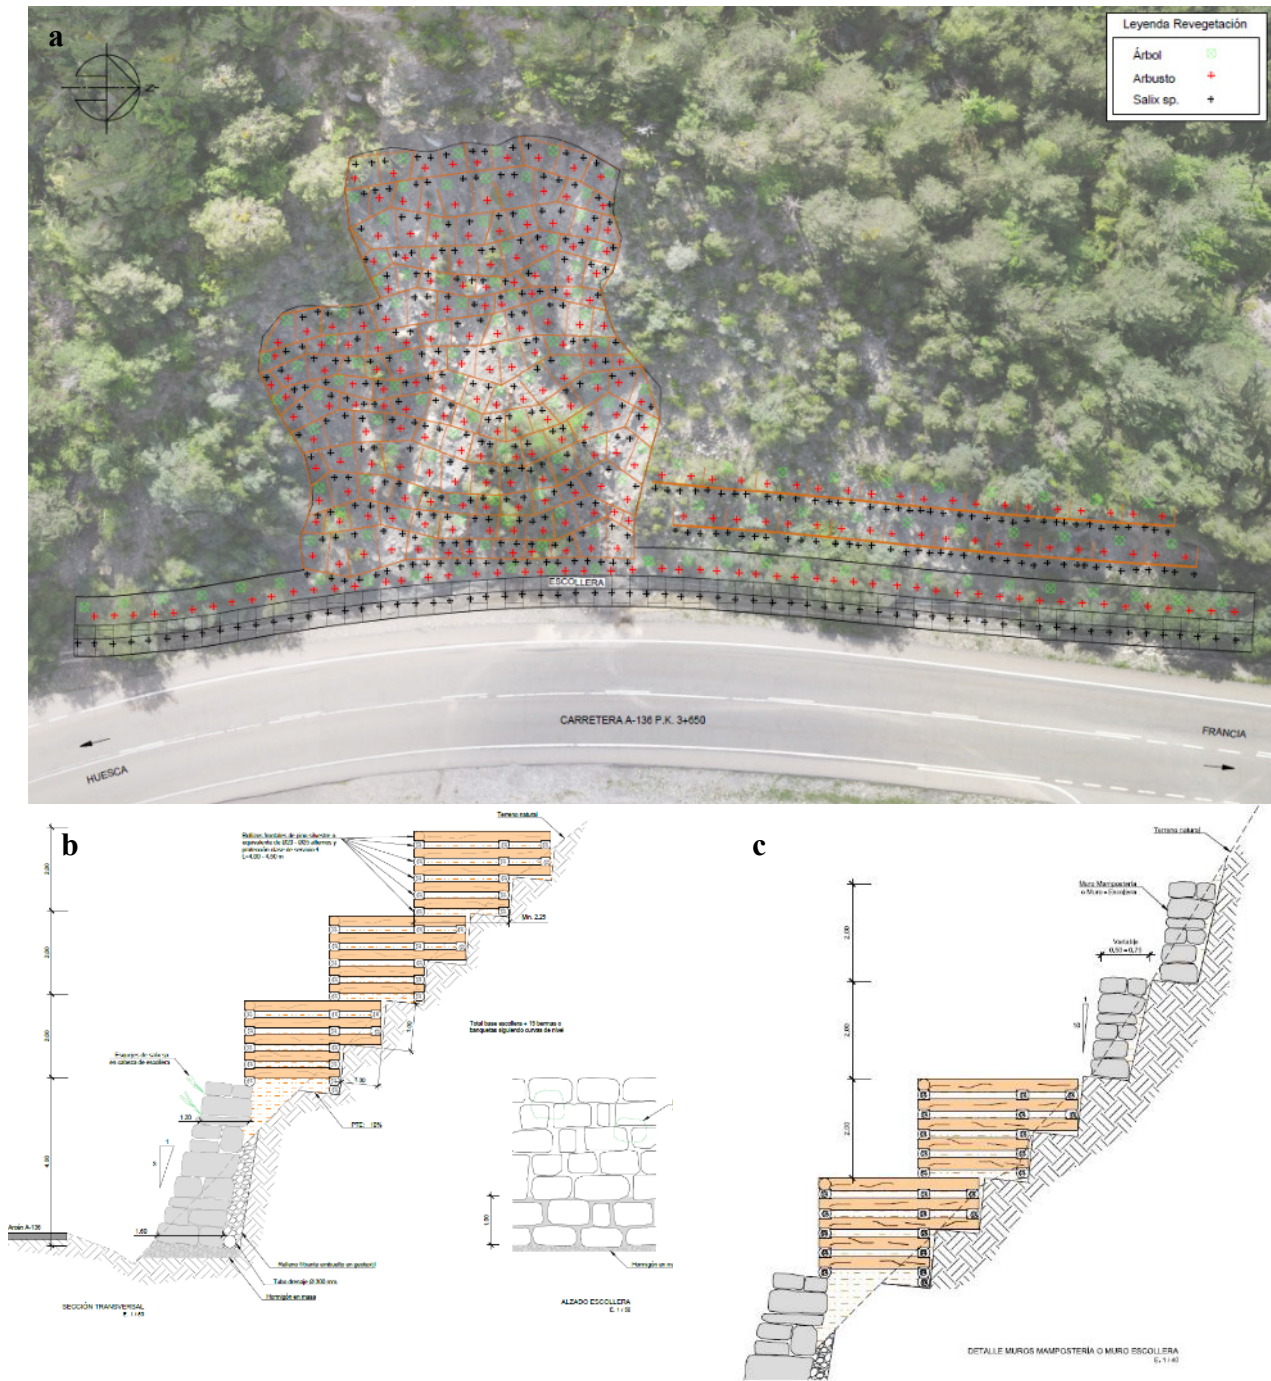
Excerpts from the design layouts. a) planimetry of the designed terraces and planted vegetation patterns; b) details on the basal masonry wall and upslope structures of wooden gabions used the terraces; c) details of masonry walls designed for preventing soil erosion in areas with steepest slopes.
